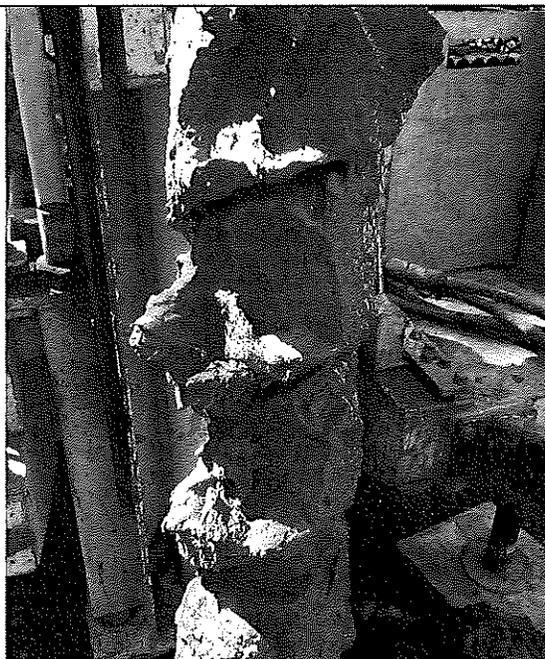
View of typical normally consolidated clay on auger encountered at depth of Wick Road and High Point reservoir sites.
